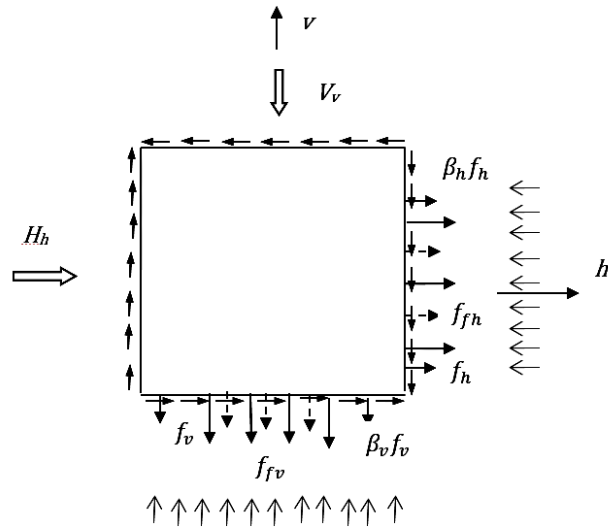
Stress Equilibrium of Beam-Column Joint Horizontal and Vertical Forces
